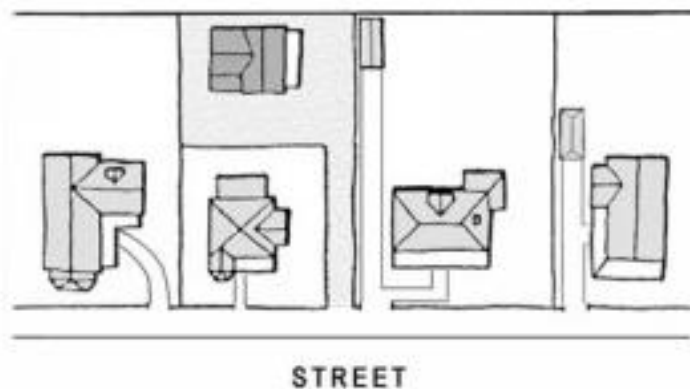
Example of appropriate subdivision and infill development which retains the setting of existing buildings.
